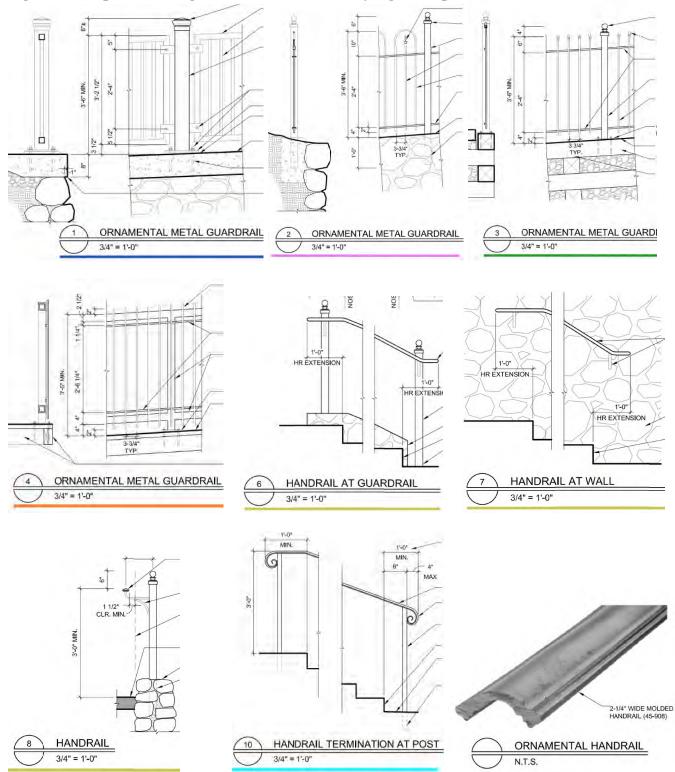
Proposed Railing & Guardrail Details (key/legend to previous map)
